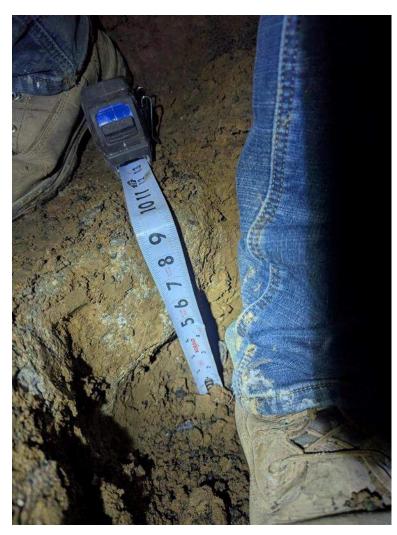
Interior Test Pit TP-3A; view of foundation thickness
